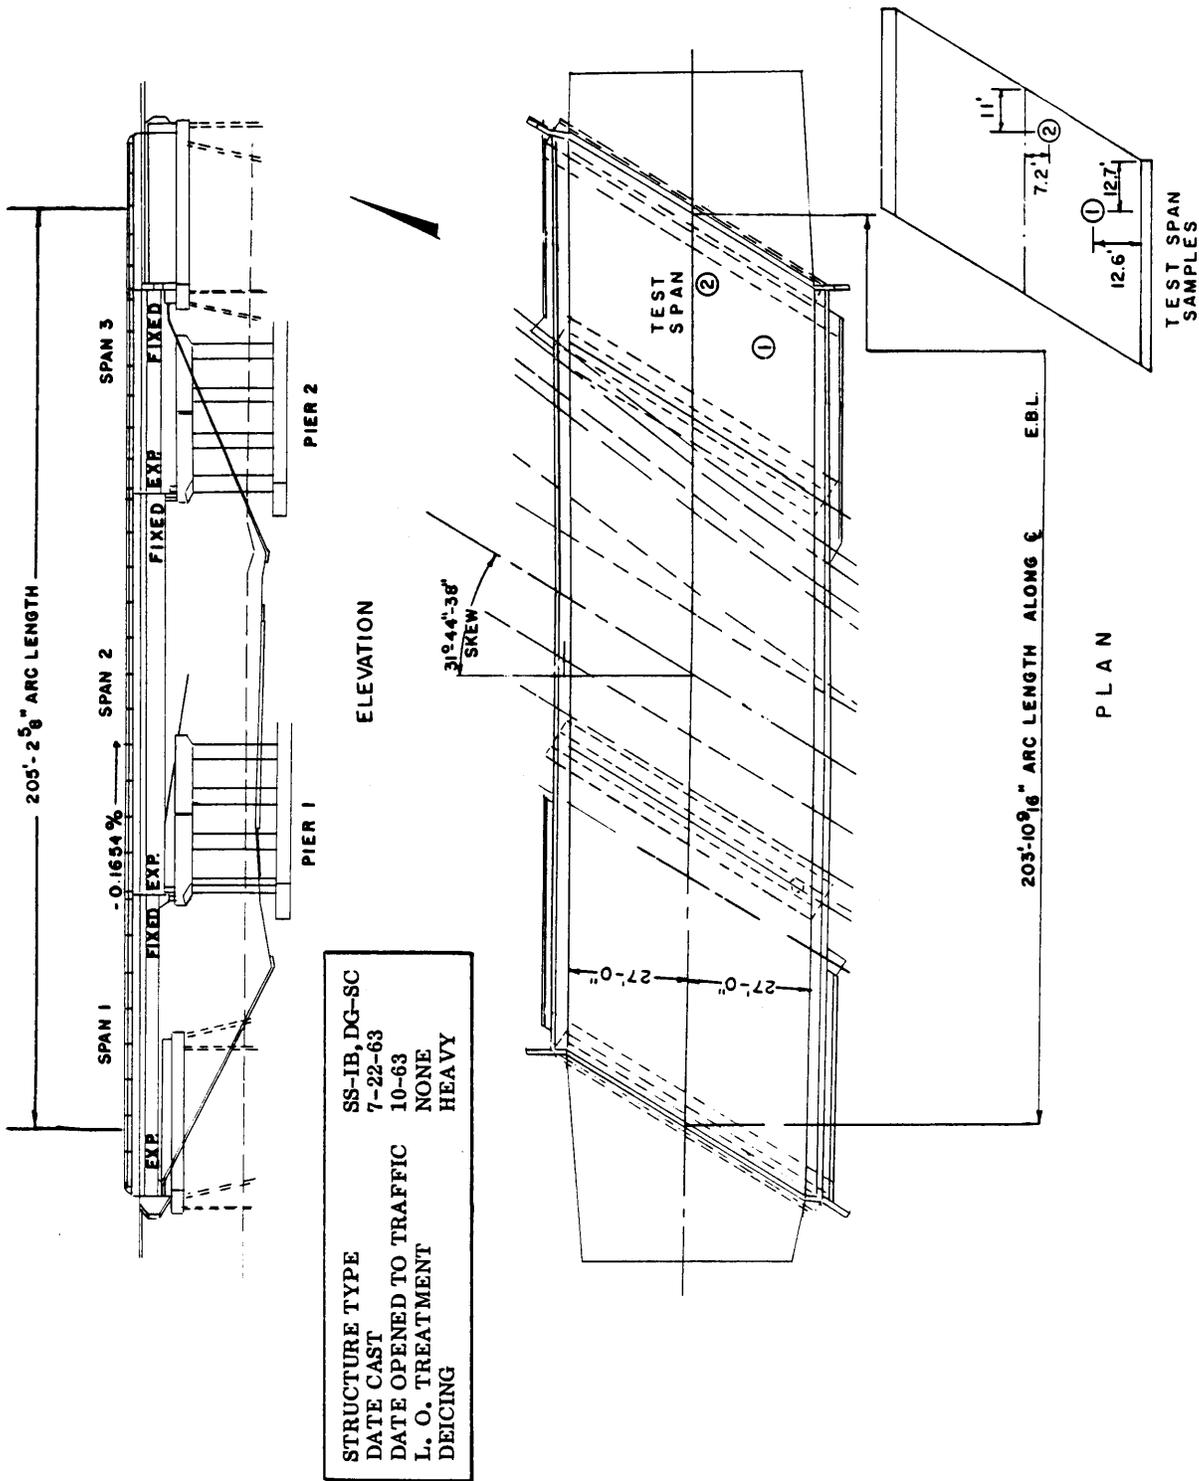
Plan for bridge #12; also shown are the locations of test samples.
